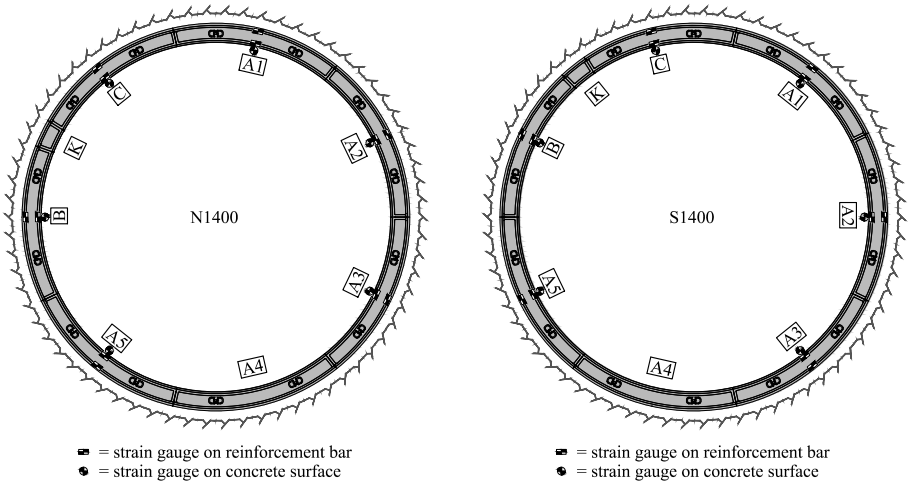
Segment orientation in tunnel sections N1400 and S1400.
